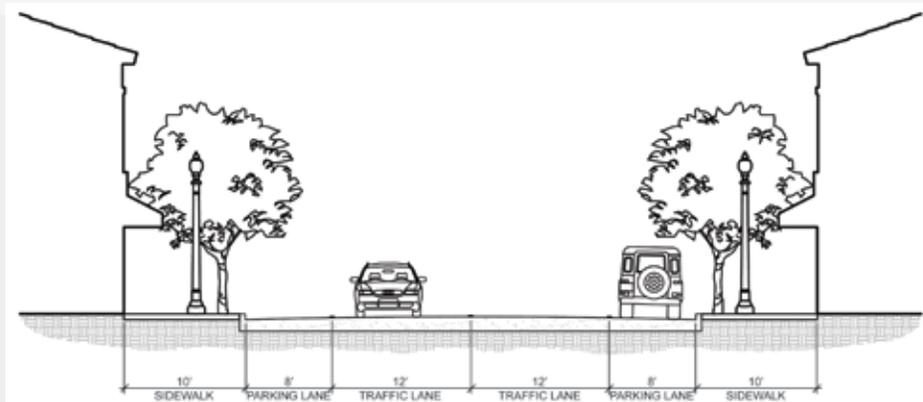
Proposed cross section of Walnut Avenue between 1st Street and 6th Street
